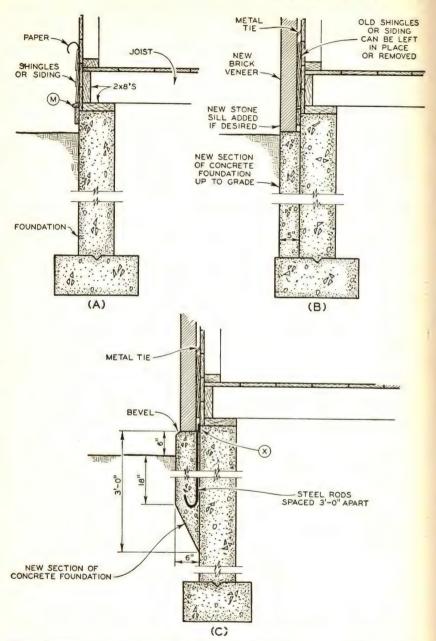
Typical Methods of Providing Foundations for Brick Veneer over Old Frame Walls
